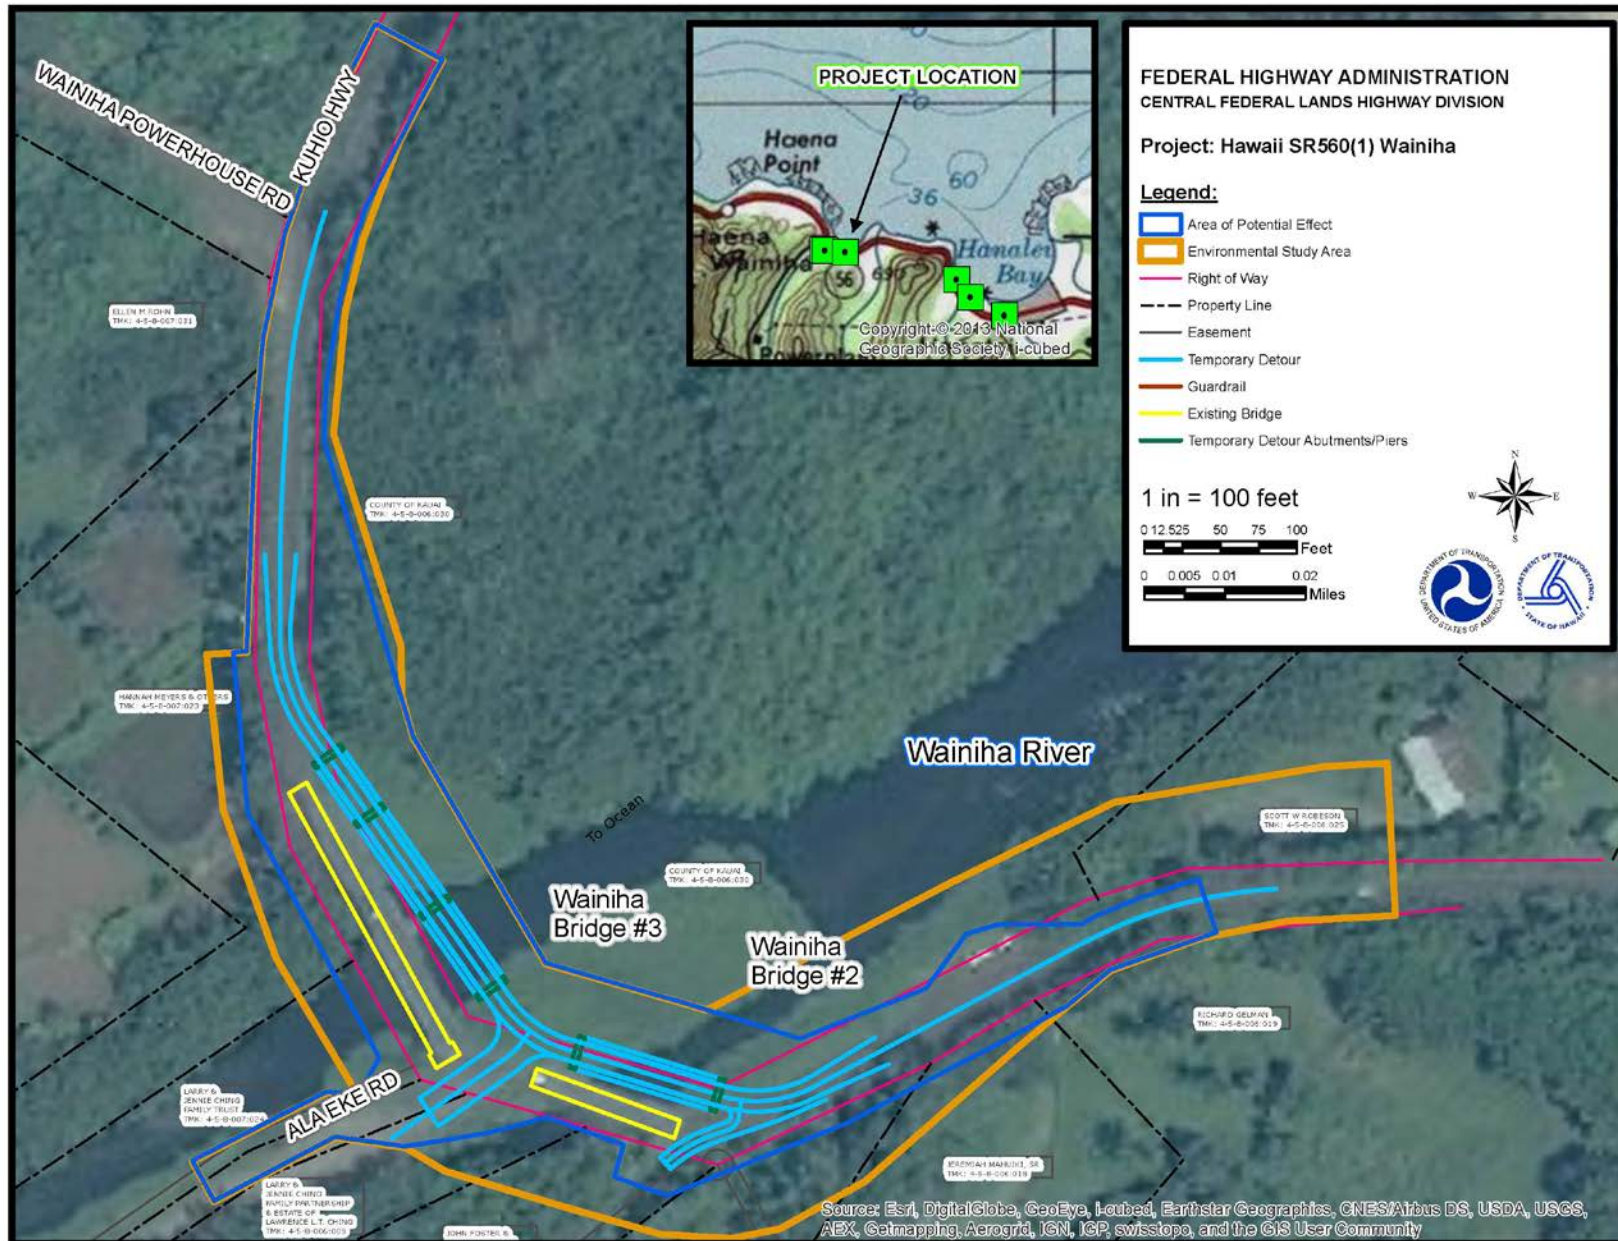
Approximate Location of Proposed Temporary Bypass Alignment at Bridges 2 and 3
